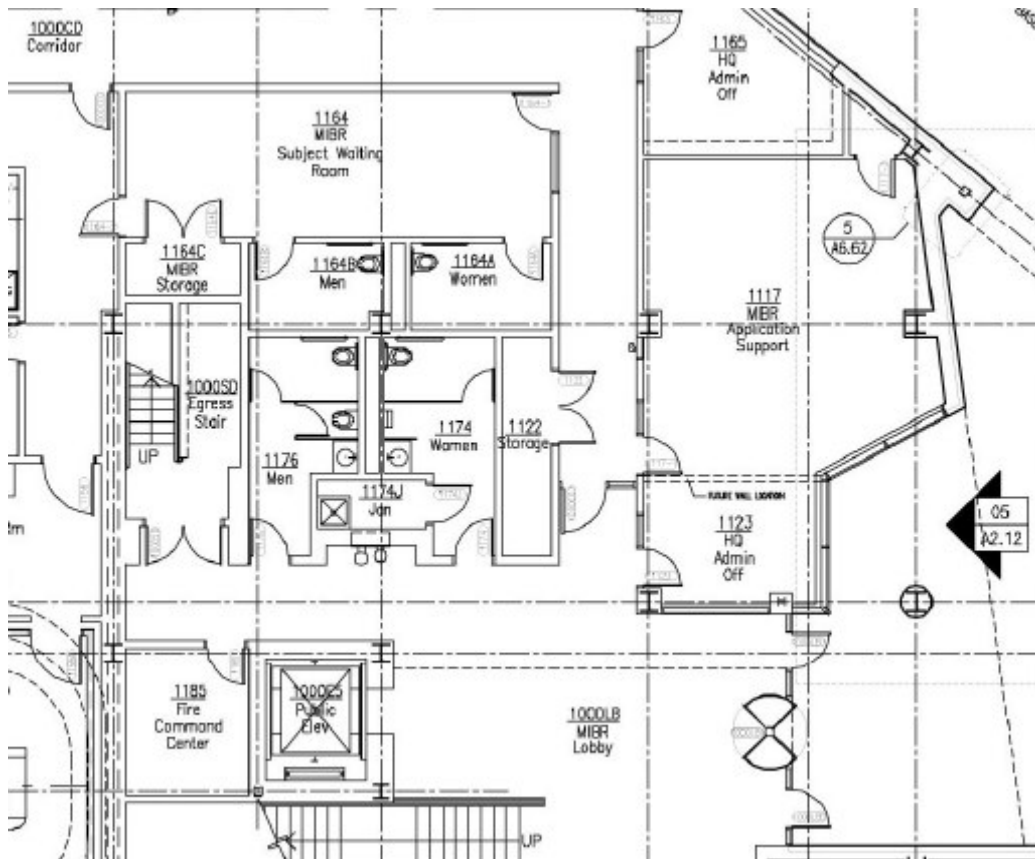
Building 46, 1st Level, Room 1171 (Shown as 1117) Layout
